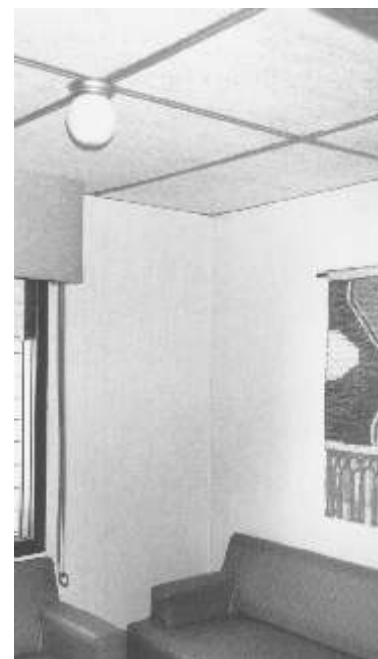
Above: House in Porto Alegre, Brazil, built with the “Climatex system” (Fig. 36) with prefabricated wall elements of woodwool slabs and concrete.
